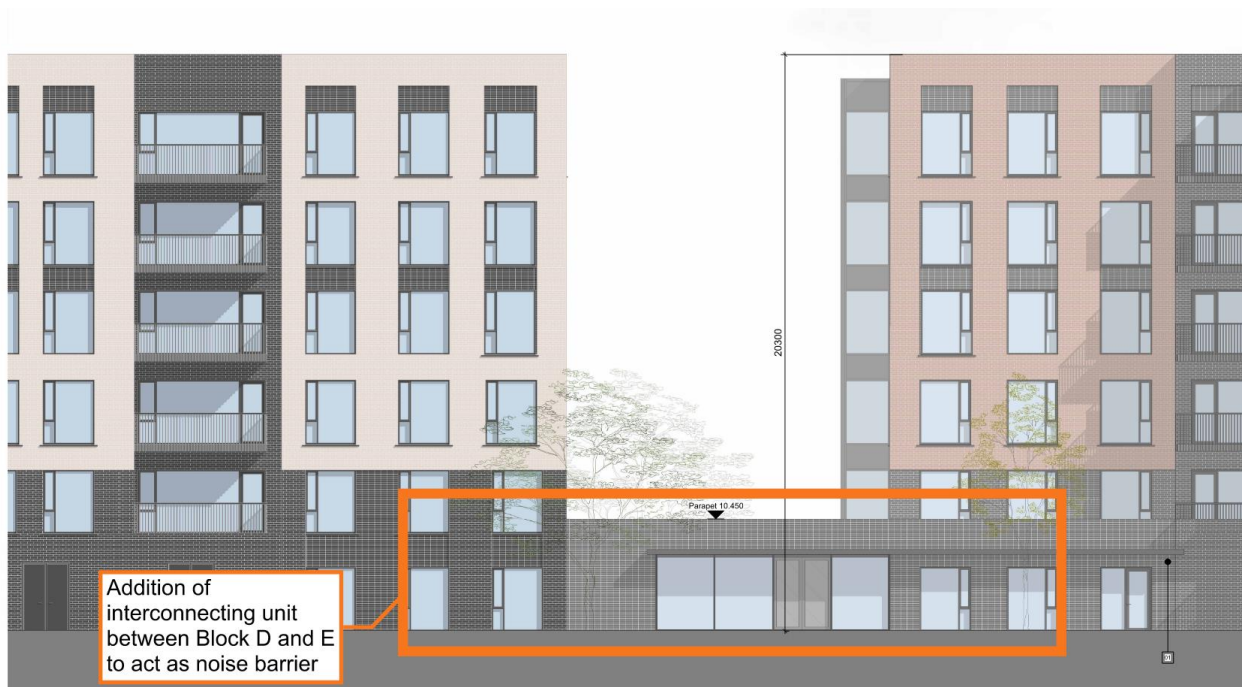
Single storey building added between Block D and E acting as a noise barrier for Public Open Space 3
